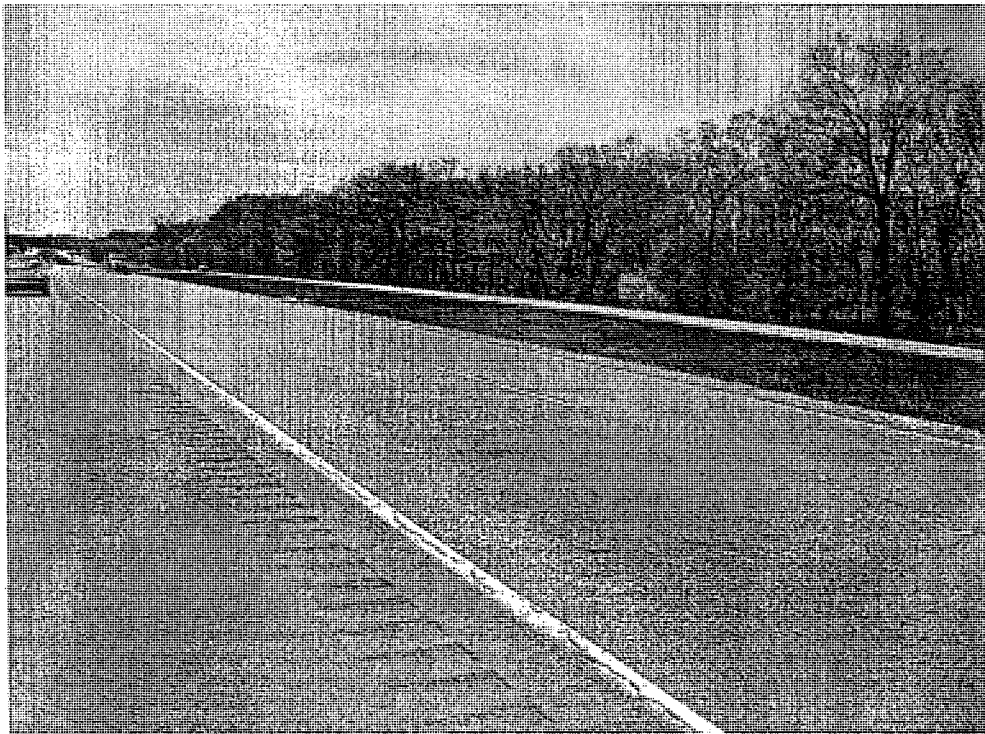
I-194 NB section test site 1 north of I-94 interchange
